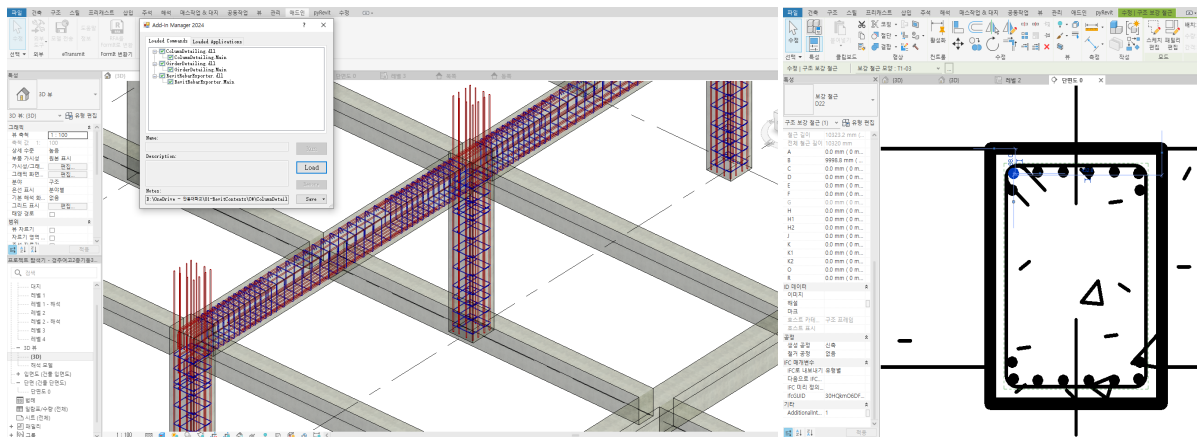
Automated rebar detailing result(left) and beam section with rebar(right)
